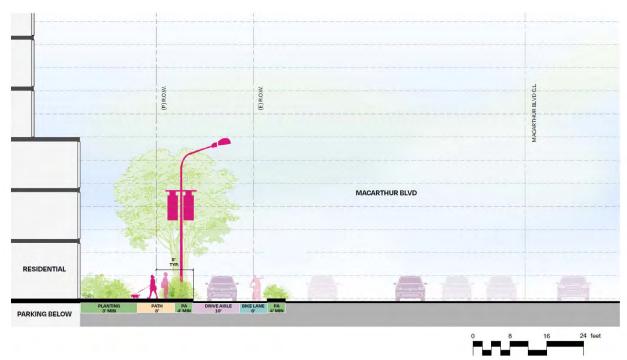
Typical Streetscape Section H (MacArthur Boulevard)
